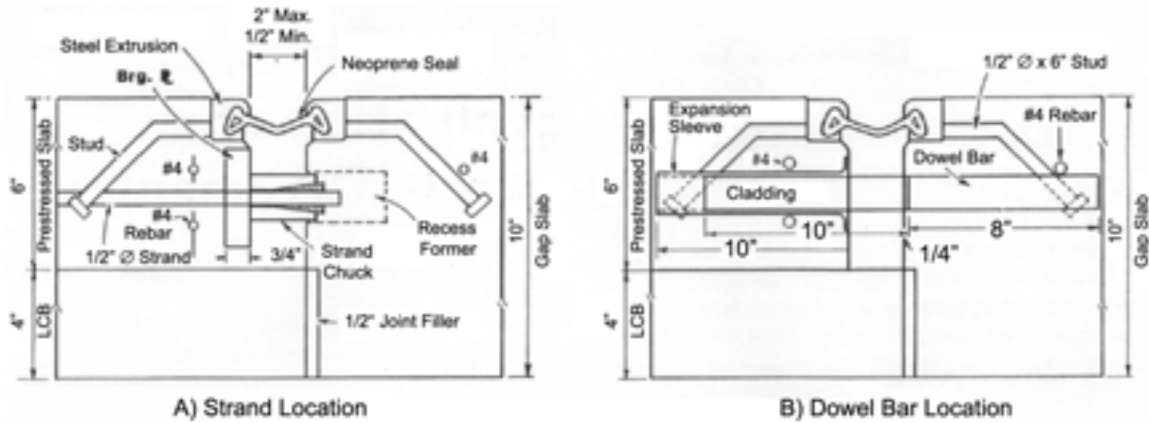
Joint detail for the PCP section built in Arizona in 1977
